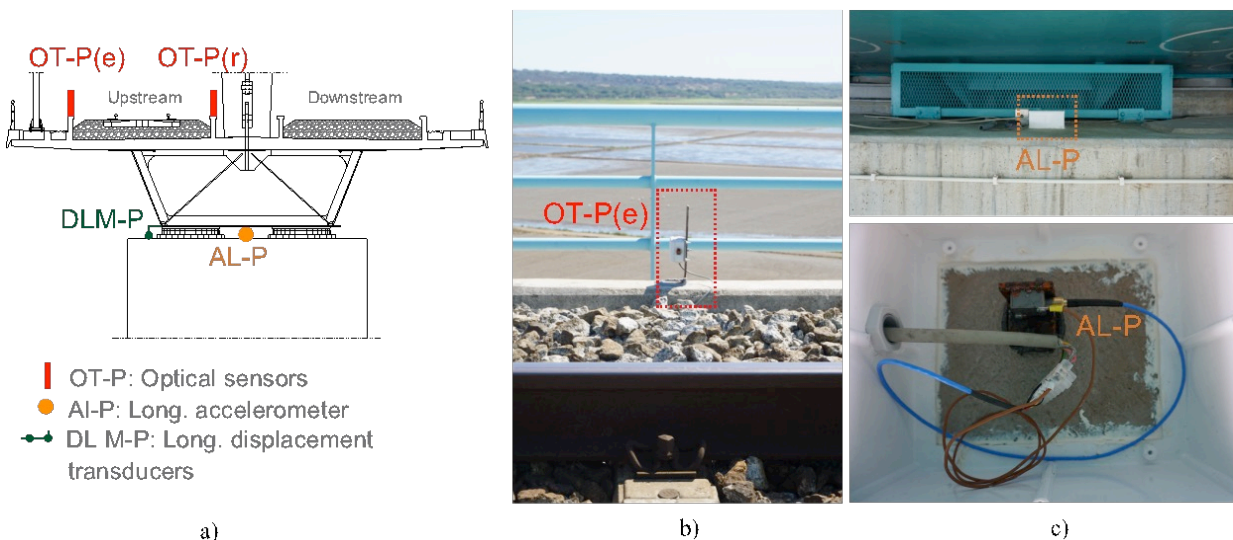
Sensors installed in the section aligned with pier P4: a) cross section of the bridge, b) optical sensor (OT-P), c) longitudinal accelerometer located between bearings (AL-P).
